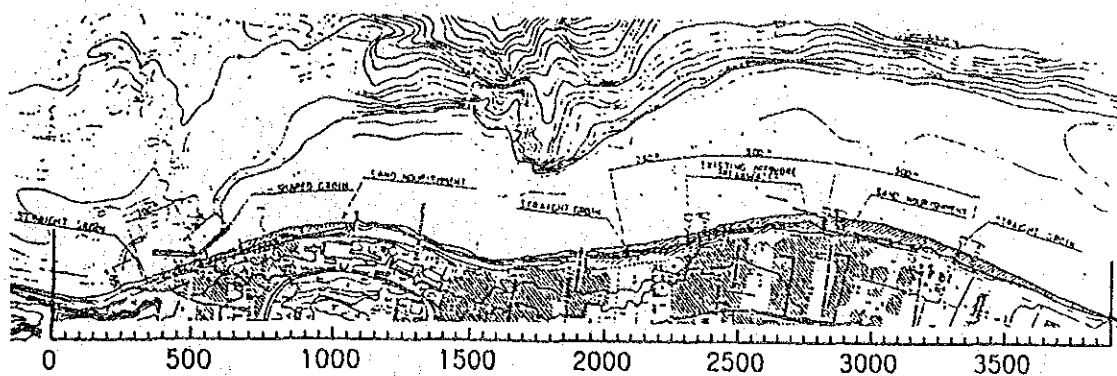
(a) Proposed Plan (Sanur, A)
